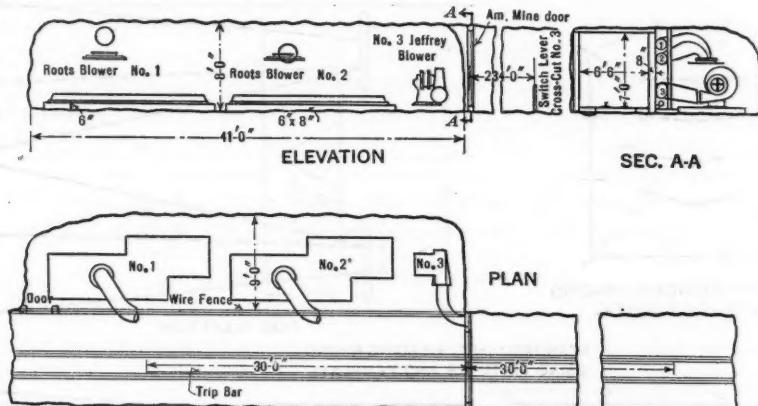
VENTILATION LAYOUT, MOFFAT TUNNEL.
